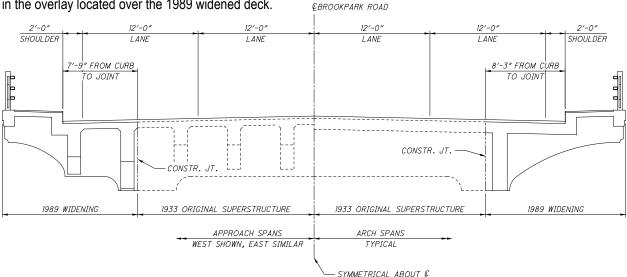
Superstructure typical sections showing the construction joints between the 1933 and 1989 construction.
